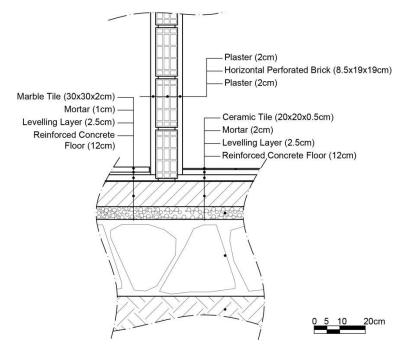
Ground Floor Interior Wall II: Between Two Office Rooms
